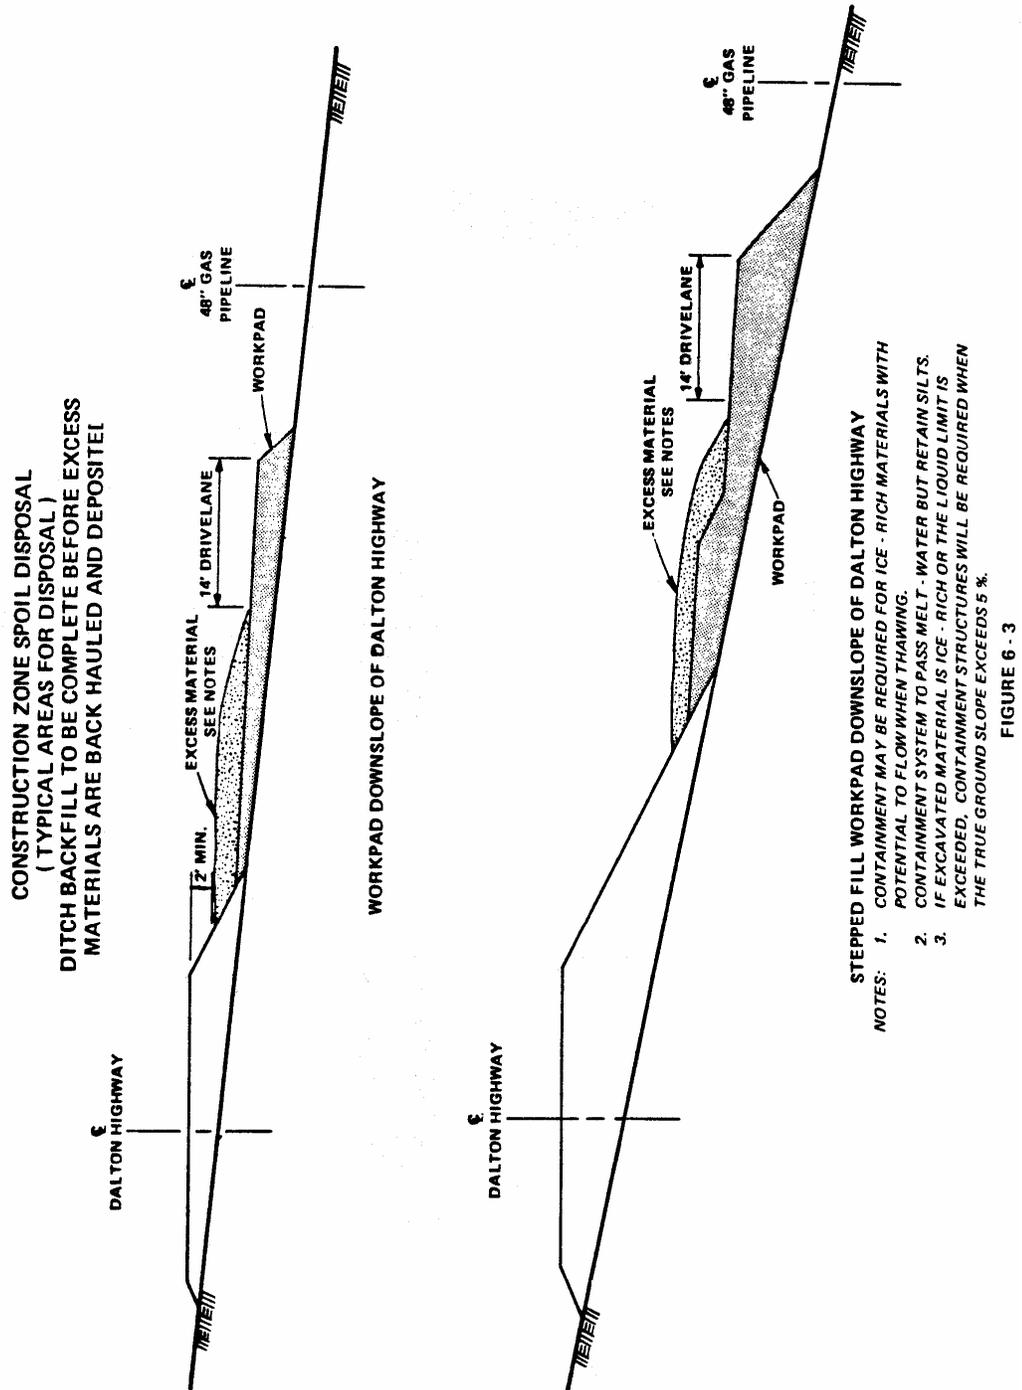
Stepped Fill Workpad Downslope of Dalton Highway
